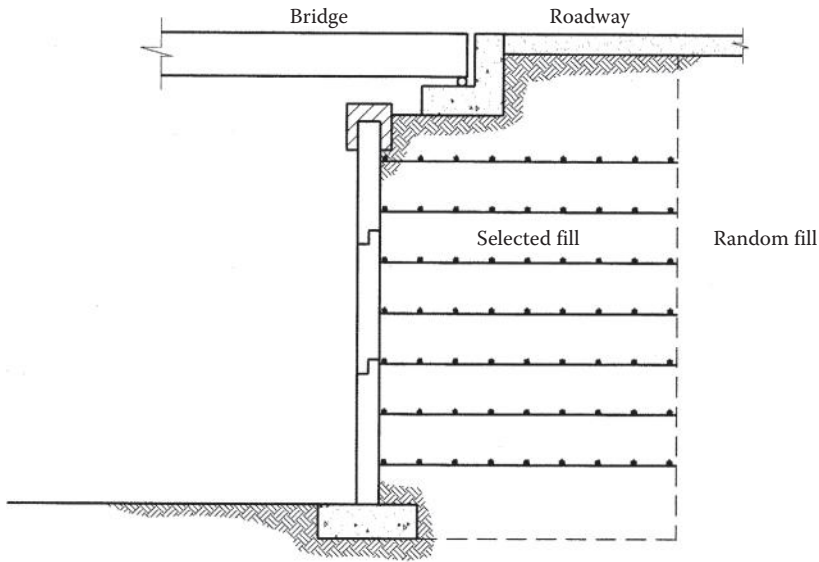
Mechanical stabilized earth (MSE) wall.
